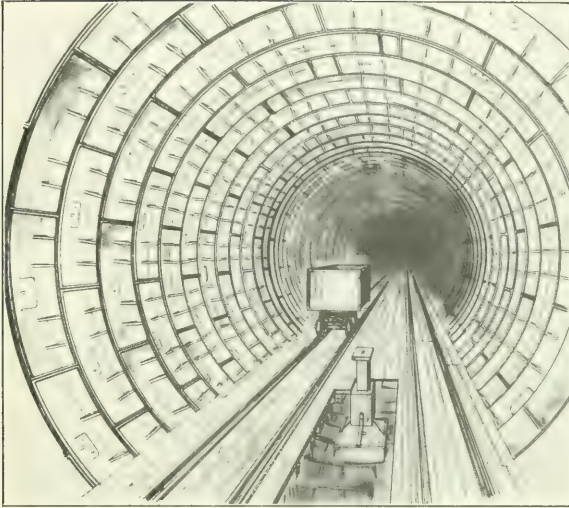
TELESCOPING STATION MARK IN FLOOR OF TUNNEL.
